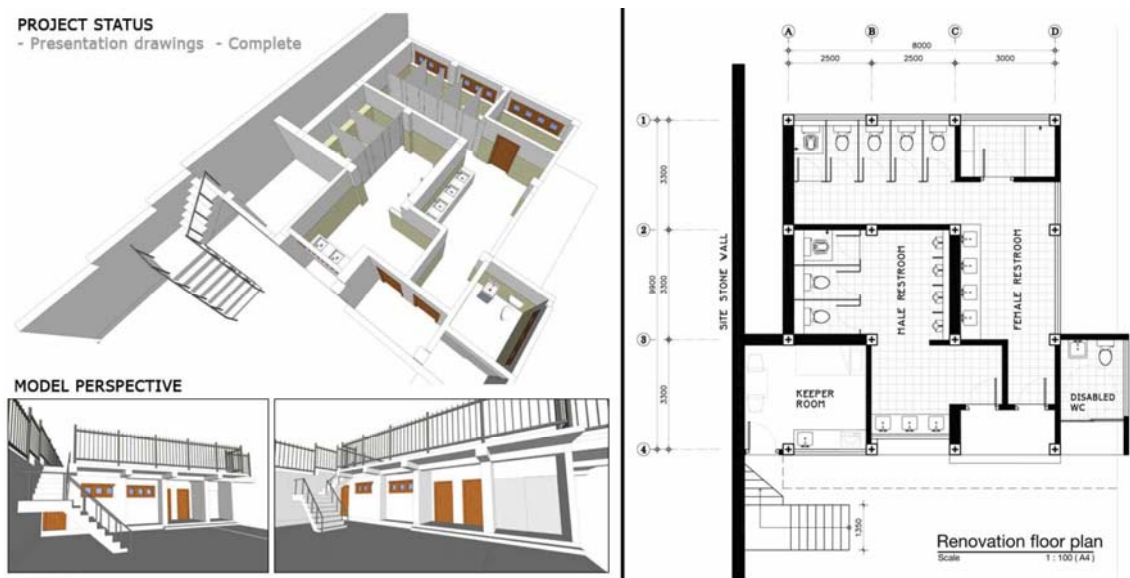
Renovation design of the existing restrooms at Memorial Chorten.
